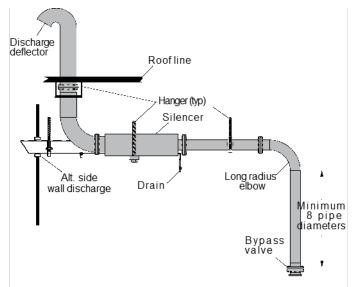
Bypass lines require special attention when routed outside, particularly when the bypass air is hot.
